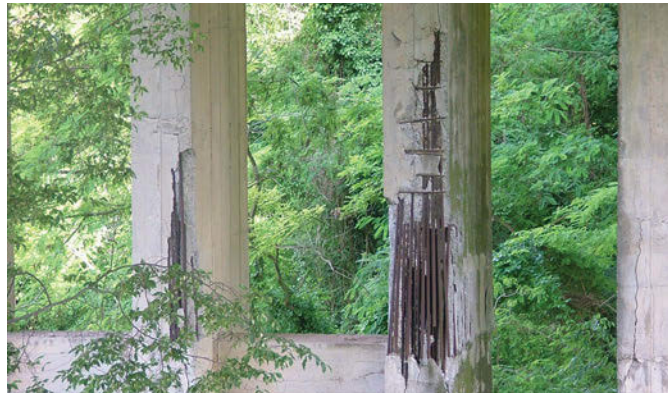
Reinforcement bars exposed and corroded in a grid full concrete quadruple rectangular pier pylon.
